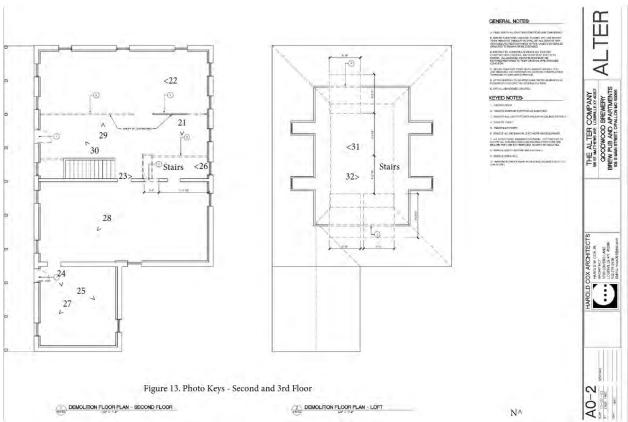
Photo Key for second and third floor. 52 Current floorplans.
